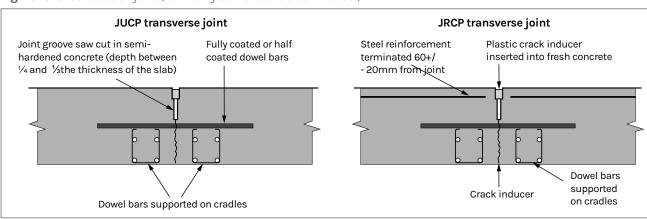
Contraction joint (formed by saw-cut and crack inducer)
